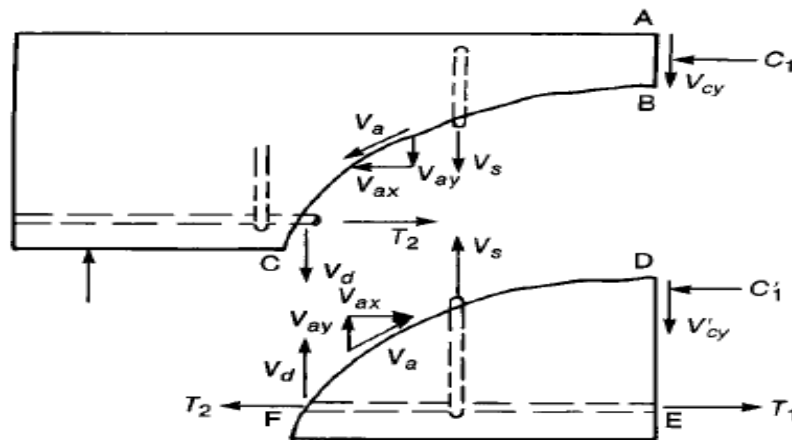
Internal forces in a cracked beam with stirrups (MacGregor)
